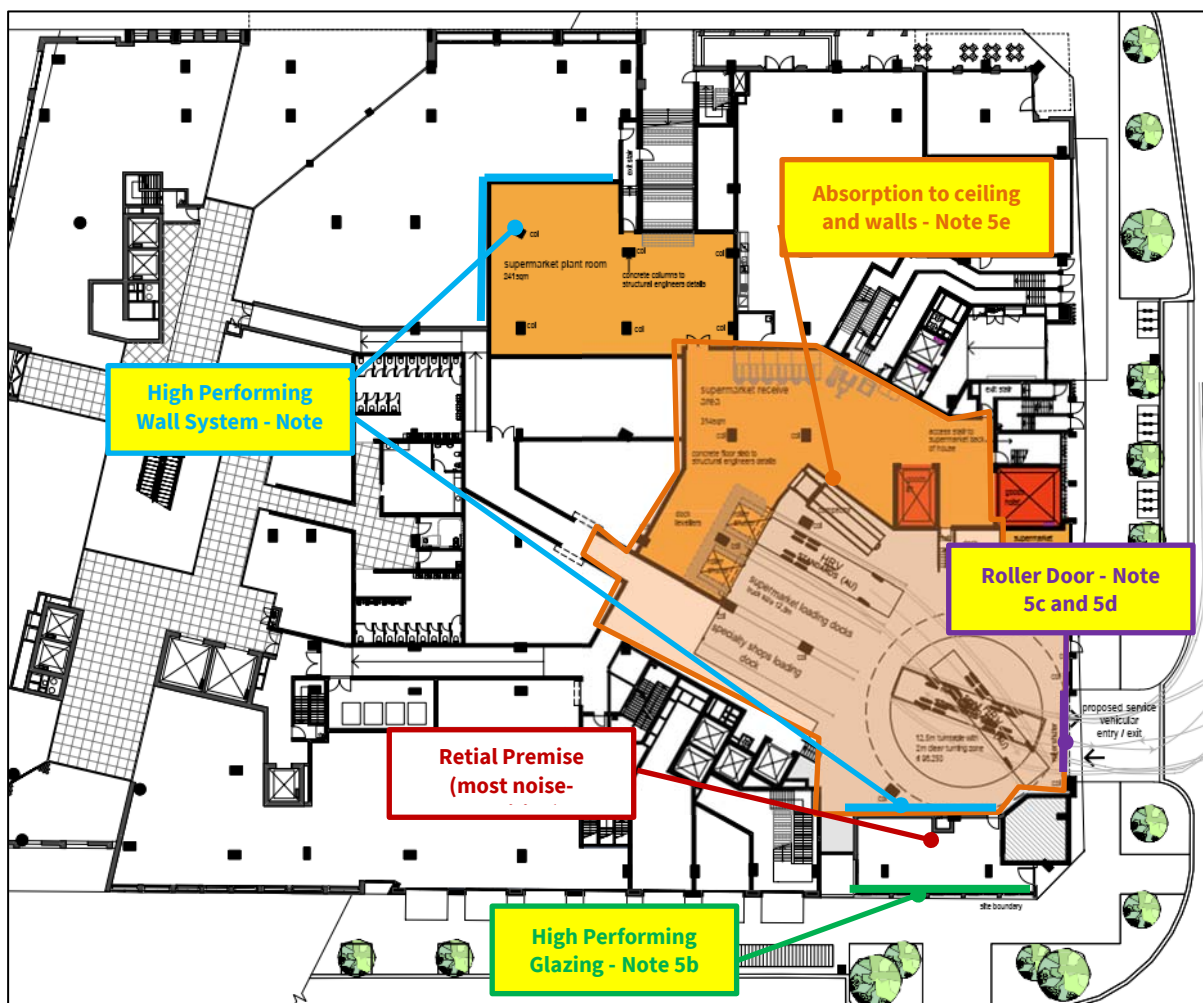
Loading dock on Level 1 (image source – architectural drawings)
